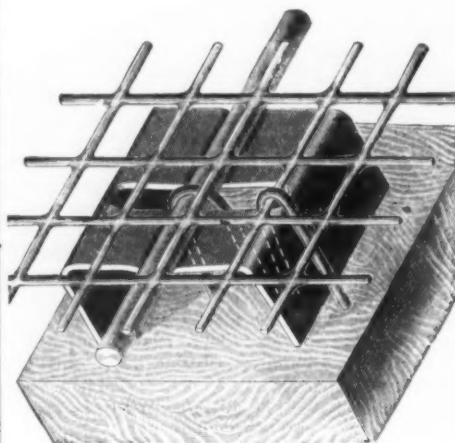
Half-Inch Metal Bearing, Showing Manner of Fastening Rods and Lathing.
